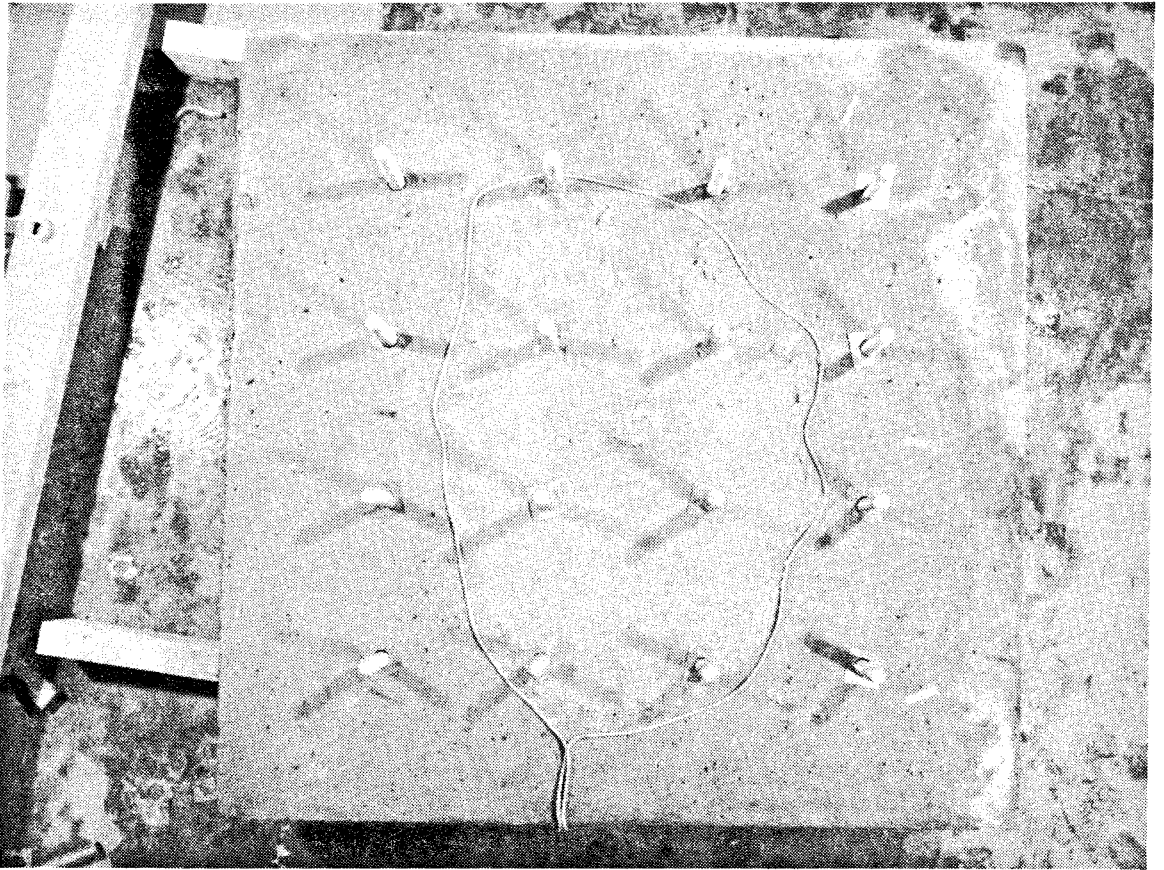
View of the surface of the lower concrete slab showing the extension of the clay grout (Test B). The white string marks the gel front
